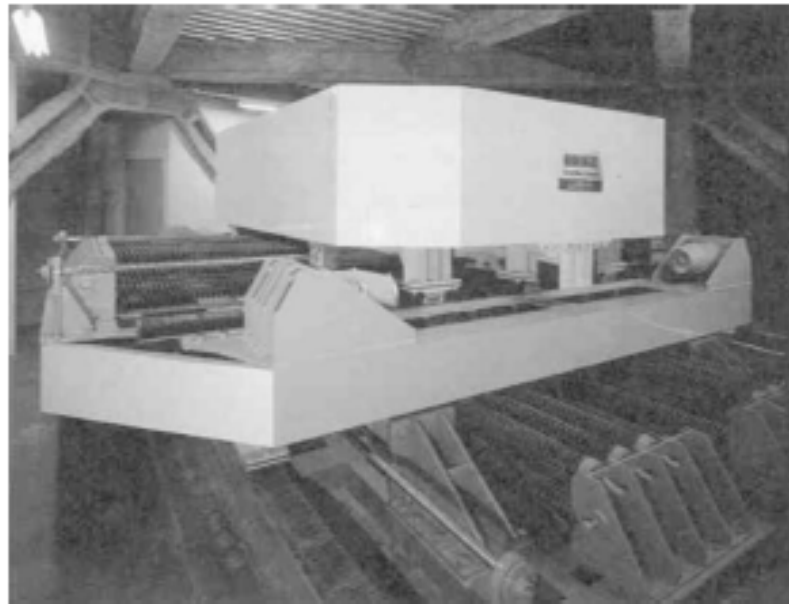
Tuned mass damper for Chiba-Port Tower. [4]
